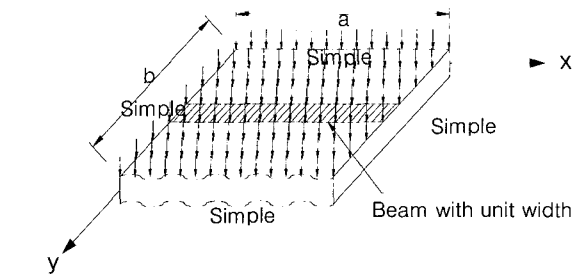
Beam with unit width of the simply supported reinforced concrete slab
